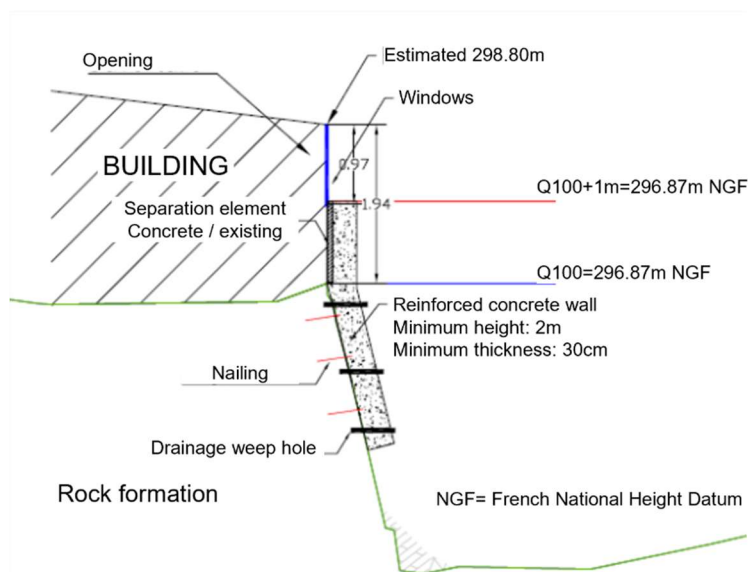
Example of wall renovation using sprayed concrete (Source: ARTELIA)
